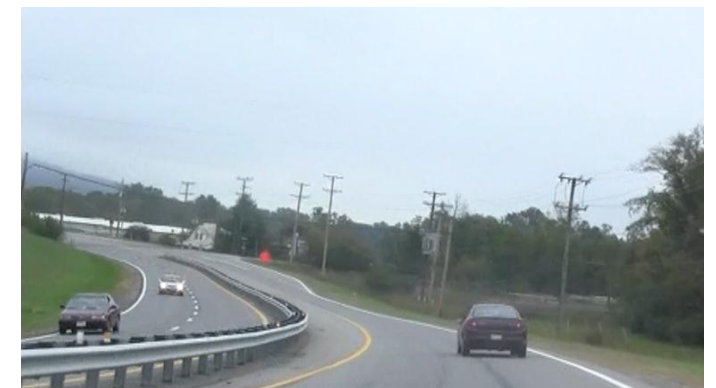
Typical roadway section between West River Road and Pleasant Run Drive (Eastbound Direction)
